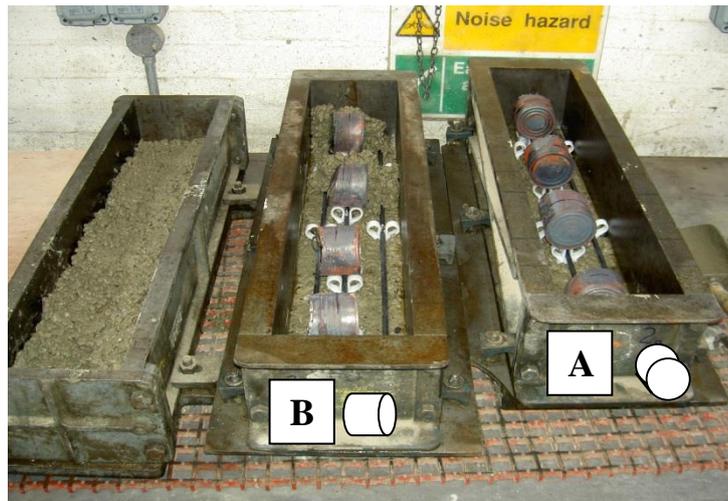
Embedding TGPU units in concrete beams at casting stage.
